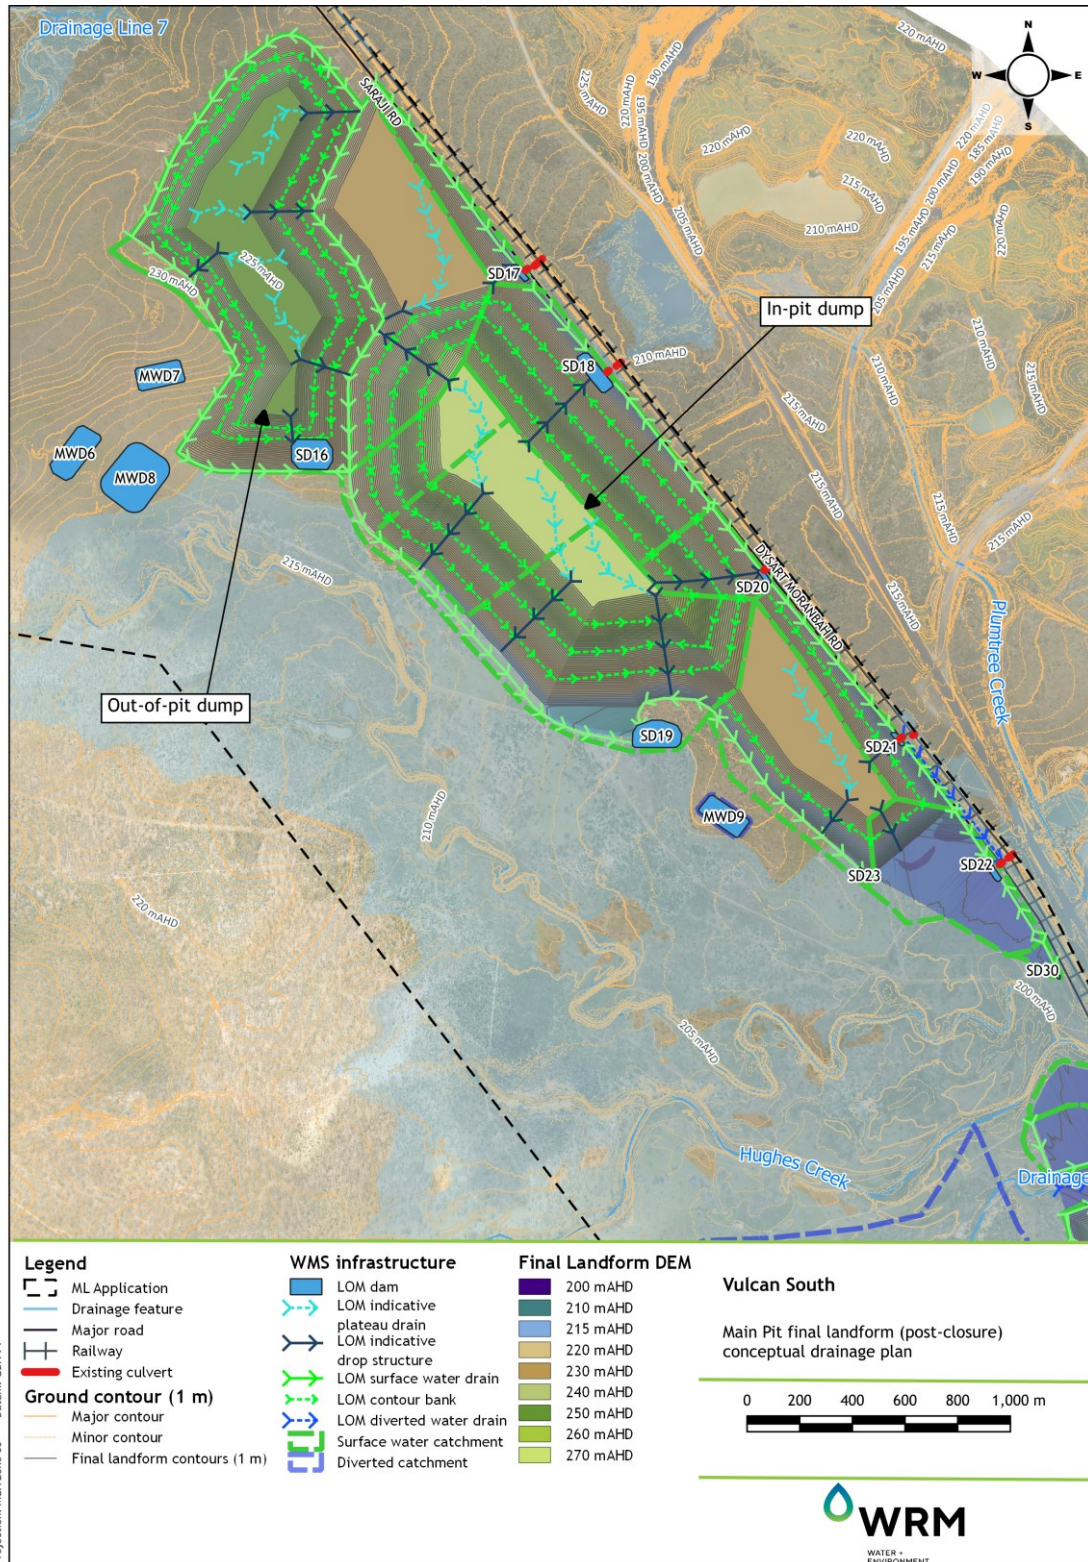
Vulcan Main final landform (post-closure) conceptual drainage plan
